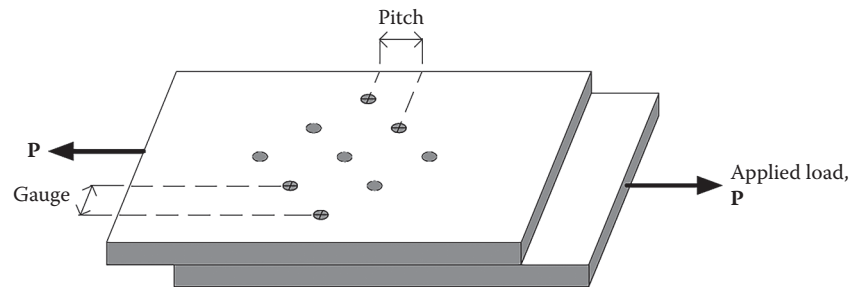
Lap joint showing rivets or bolts penetrating through two plates and connecting them together
